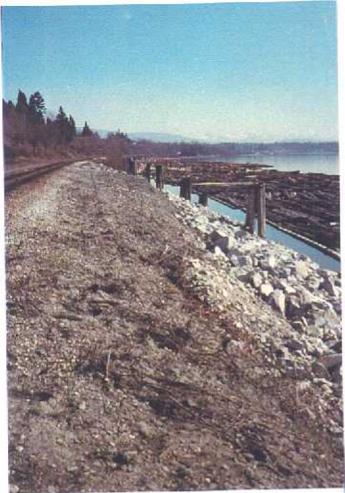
Rip-rap protection on riverbank slope below CPR tracks.
